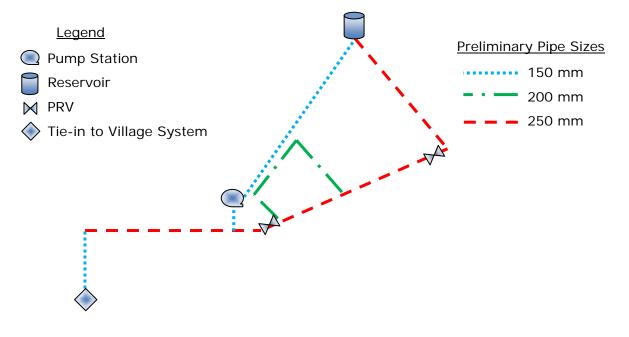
Servicing Arrangement 1-B (SRD Site Only, Fire Flow from Reservoir)
